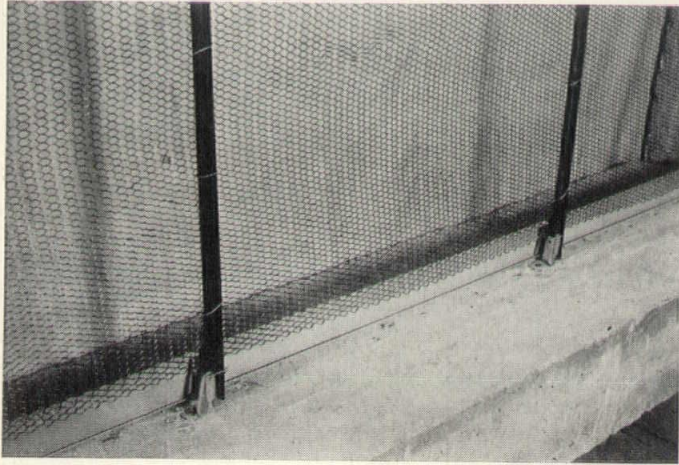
Construction view of exposed face of 1½" partition, showing metal base, clips, steel channels, and metal lath assembly.
